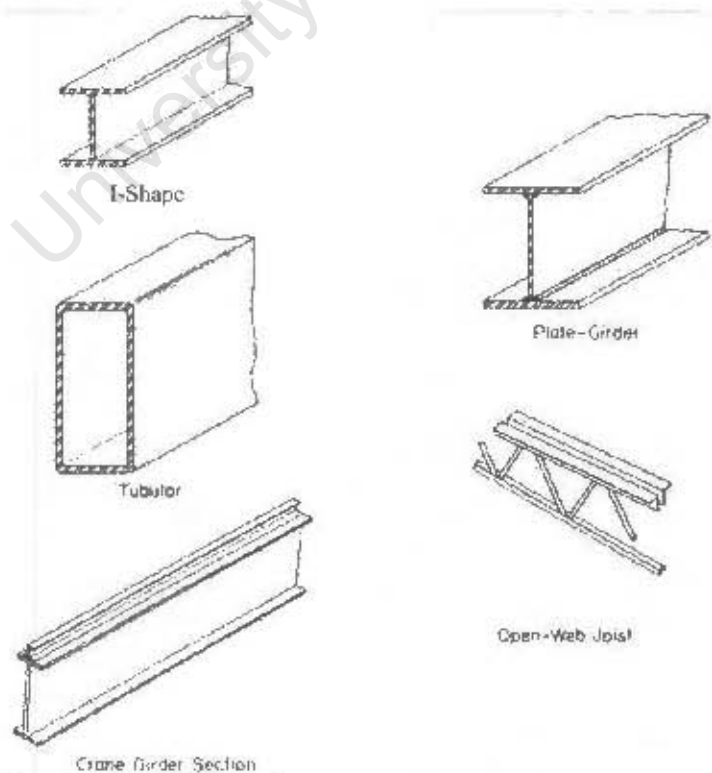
<sup>(a)</sup>: Different beam cross-sections
